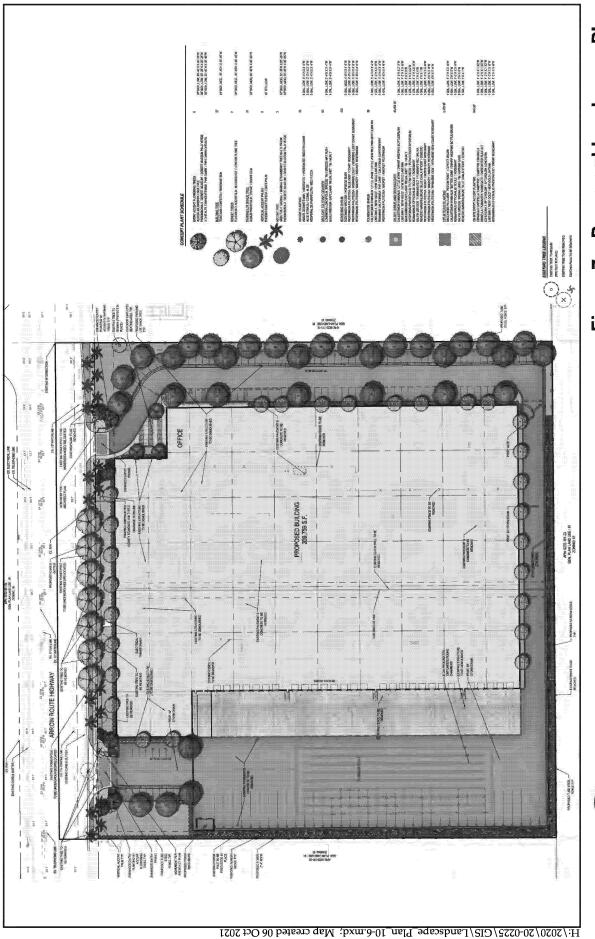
Proposed Landscape Plan 15719 and 15755 Arrow Route Warehouse
